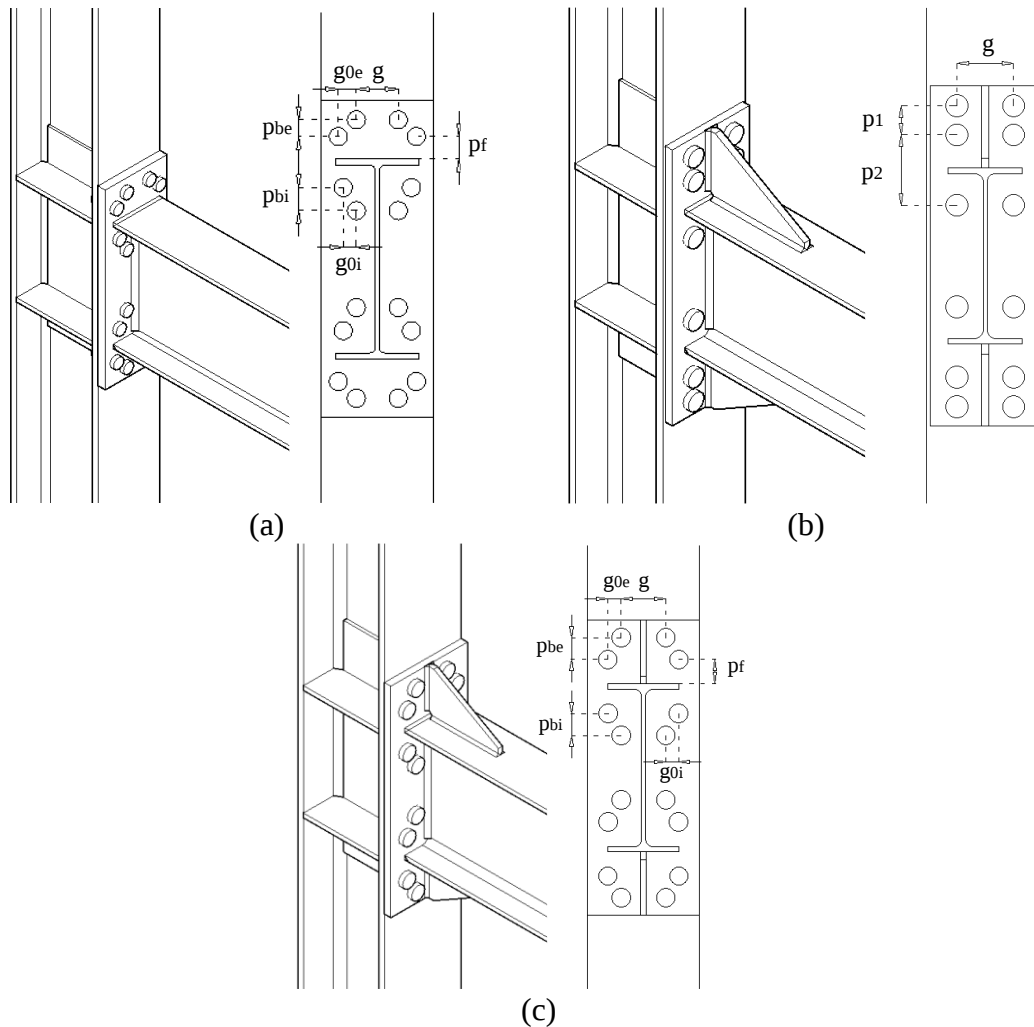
Analyzed joint configurations: a) unstiffened 8EM joint; b) six-bolt rows extended stiffened joint; c) 8EM joint with stiffeners
